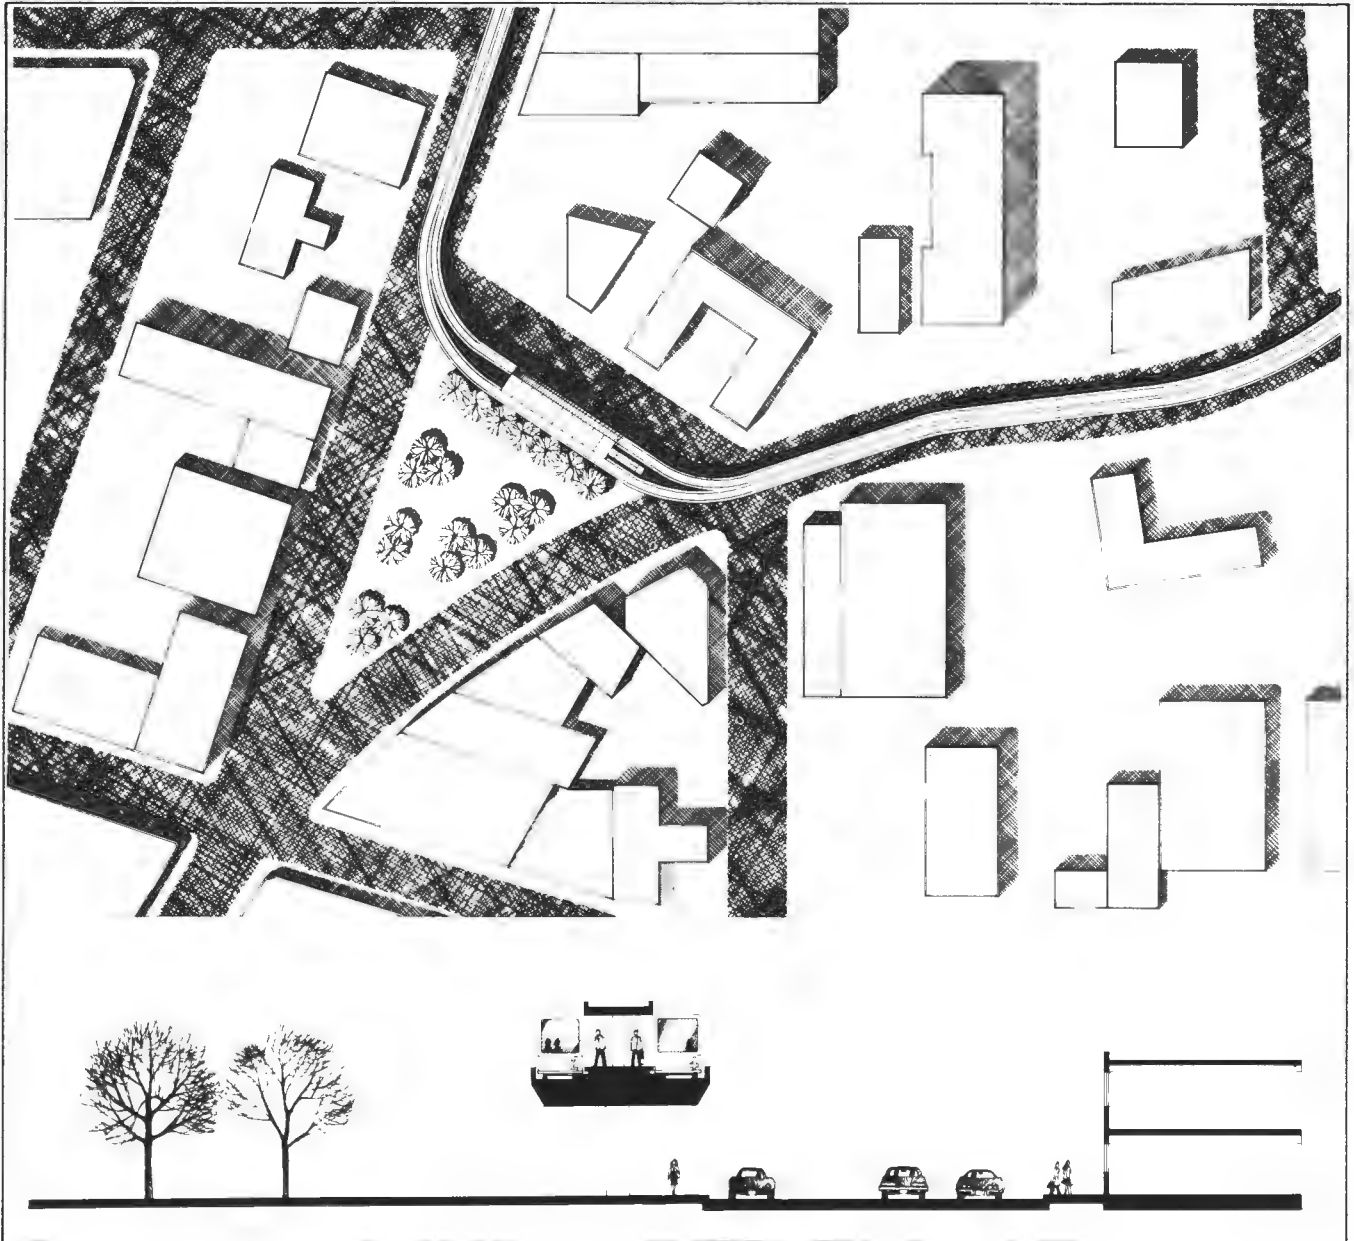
Site Plan and Cross-Section of AGT Station at Buckhead
